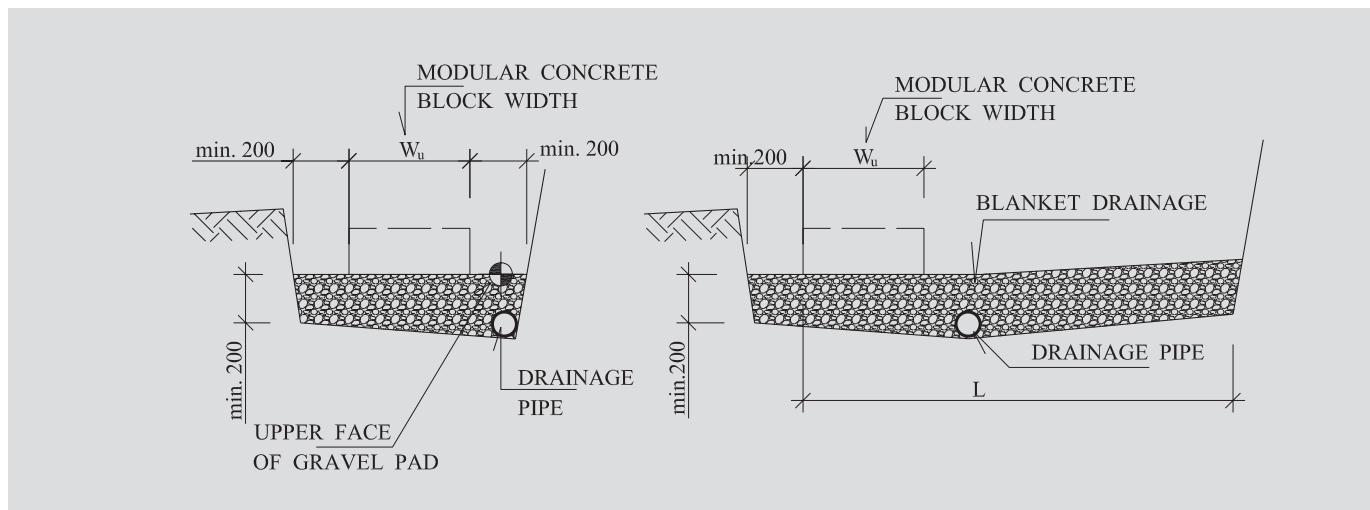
Widths of gravel pads for retaining walls with and without blanket drainage
